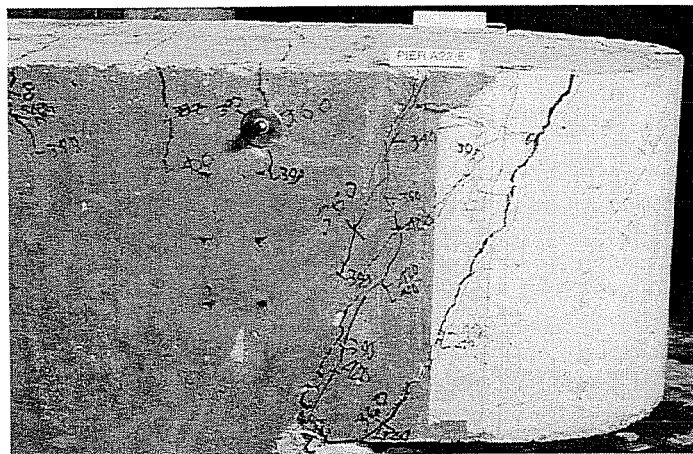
Damage to Pier A2-2 After Failure
